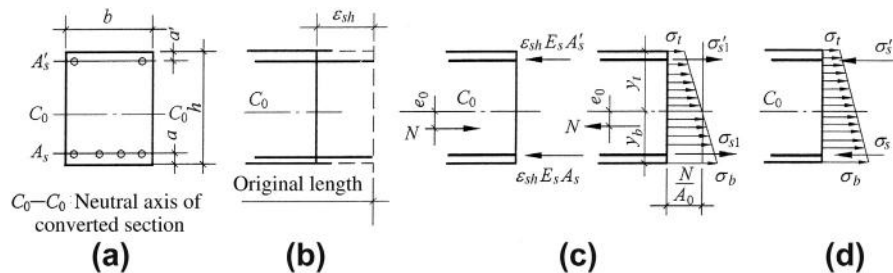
Practical calculation for shrinkage of concrete beam: (a) section, (b) free shrinkage of concrete, (c) stress states at two stages, (d) stress distribution
